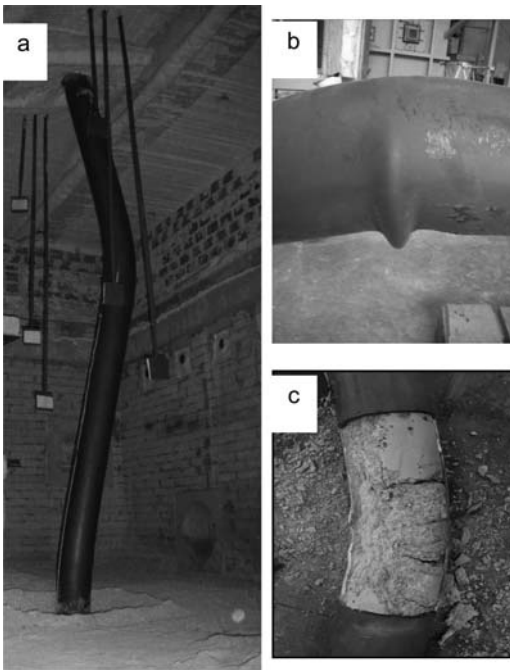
Column after failure: a) Overall buckling of the column, b) Local buckling at mid-height, c) Concrete cracking.
